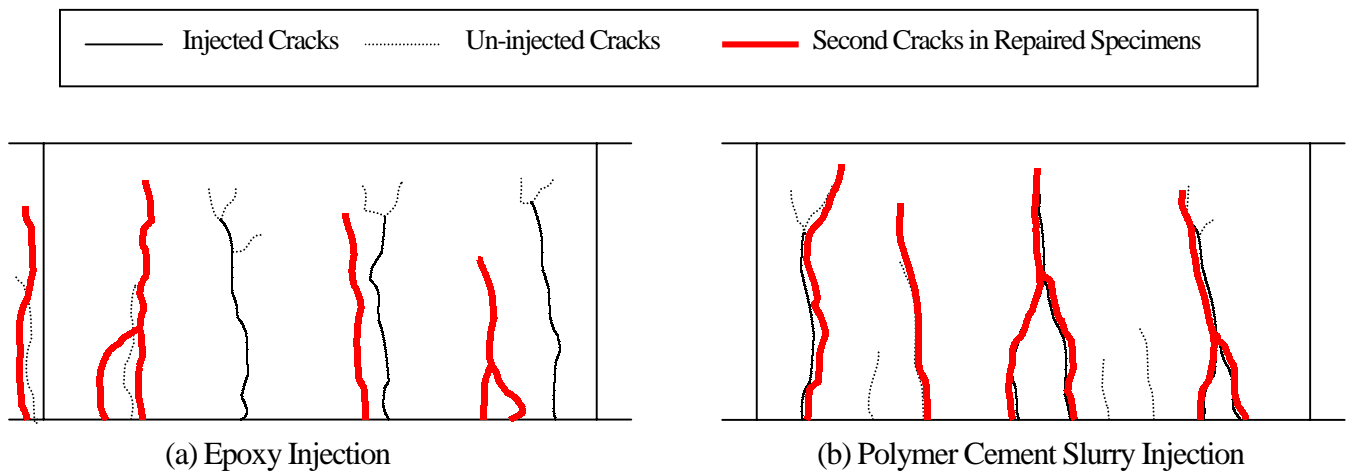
Examples of Crack Patterns in Moment Span of Repaired Reinforced Concrete Beams
